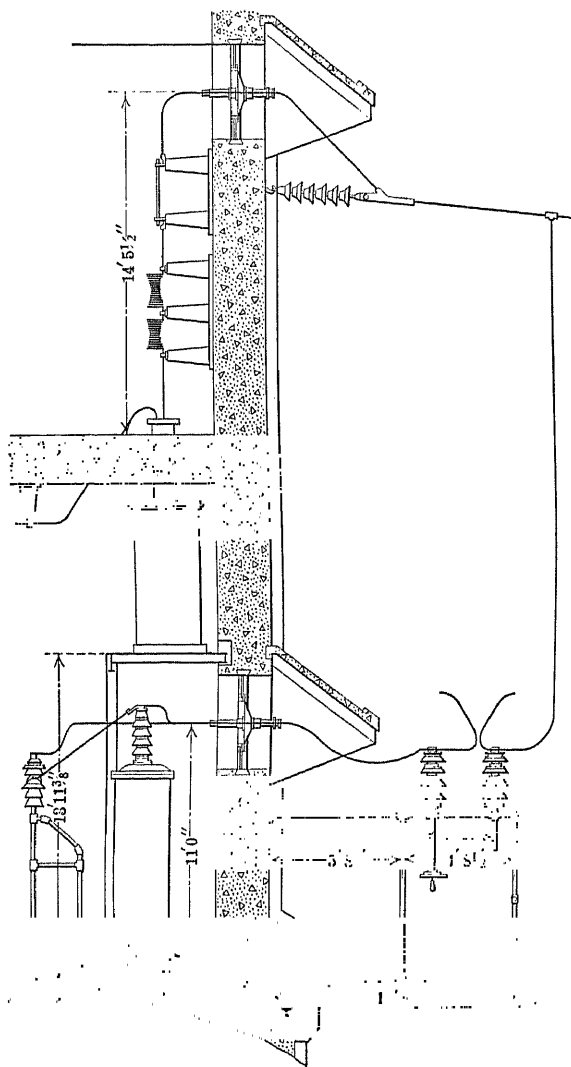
Transformer House Showing Outgoing Line and Lightning Arrester Connections
